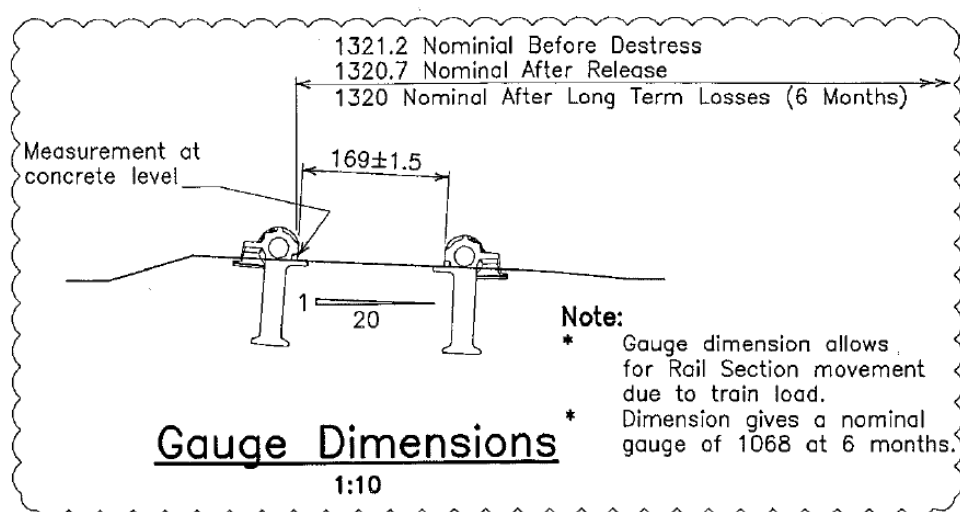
Standard Drawing (September 2011), identifying how a gauge narrower than 1068mm is designed, as it assumes movement will occur over time, depending on the frequency of train tonnage, but a nominal gauge of 1068mm could be expected after 6 months.
